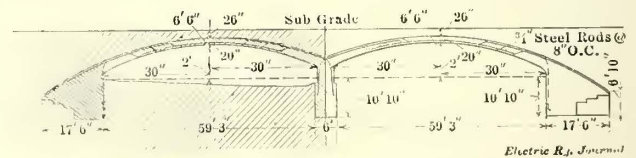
Bridge Reconstruction on Columbus & Lake Michigan Railway—Cross-section of Bridge 816.
